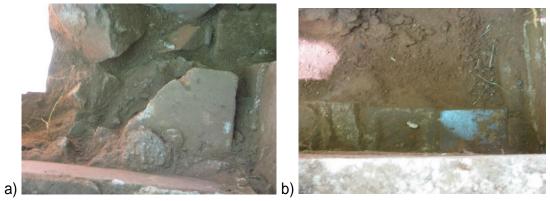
Inside of the fireplace: a) concrete corner and b) salt glazed bricks.
